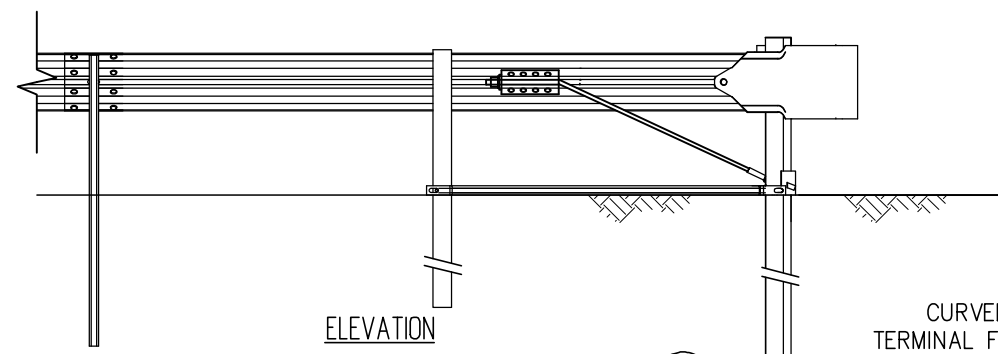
(CABLE ANCHORED "W" SECTION)
